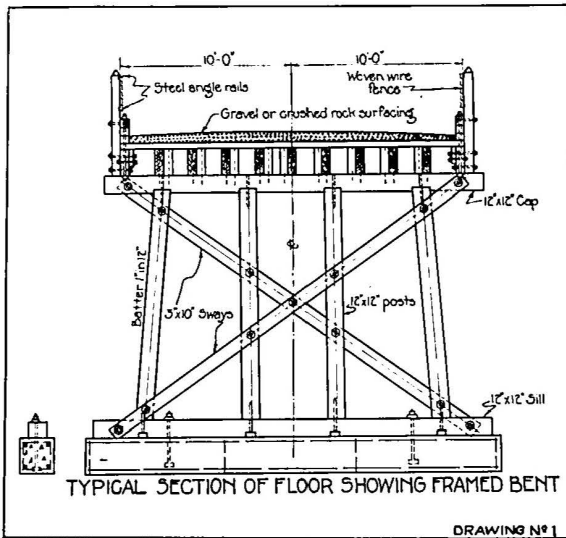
Treated Timber Bridge Design. (*N.M. Highway Journal*, February 1928, p. 7)
